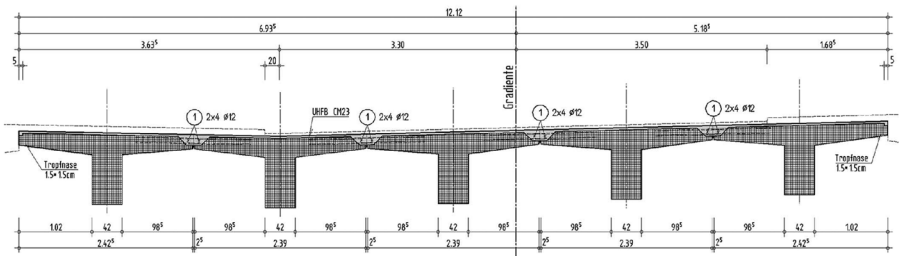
HLSV pilot project: section through bridge superstructure (multi-web T-beam)
